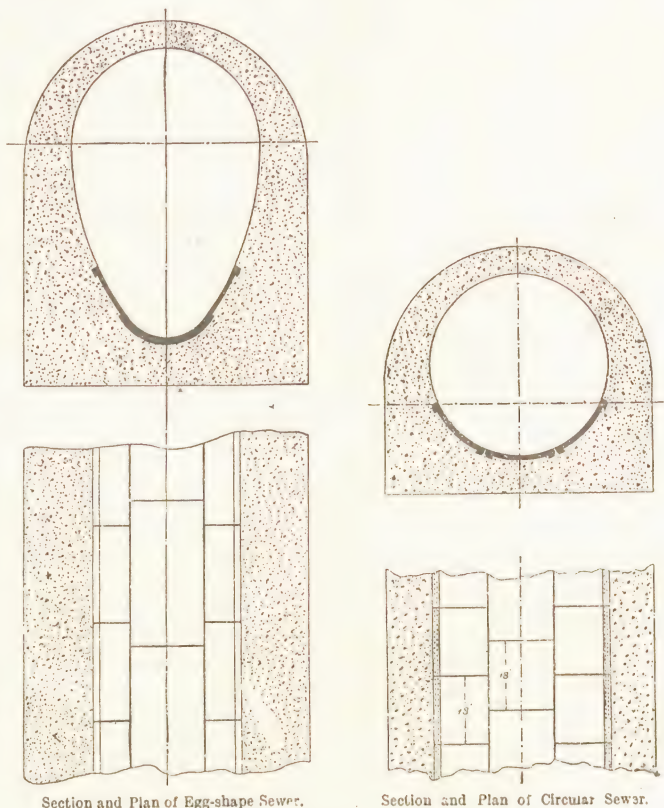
Concrete sewer with glazed stoneware invert tiles.
